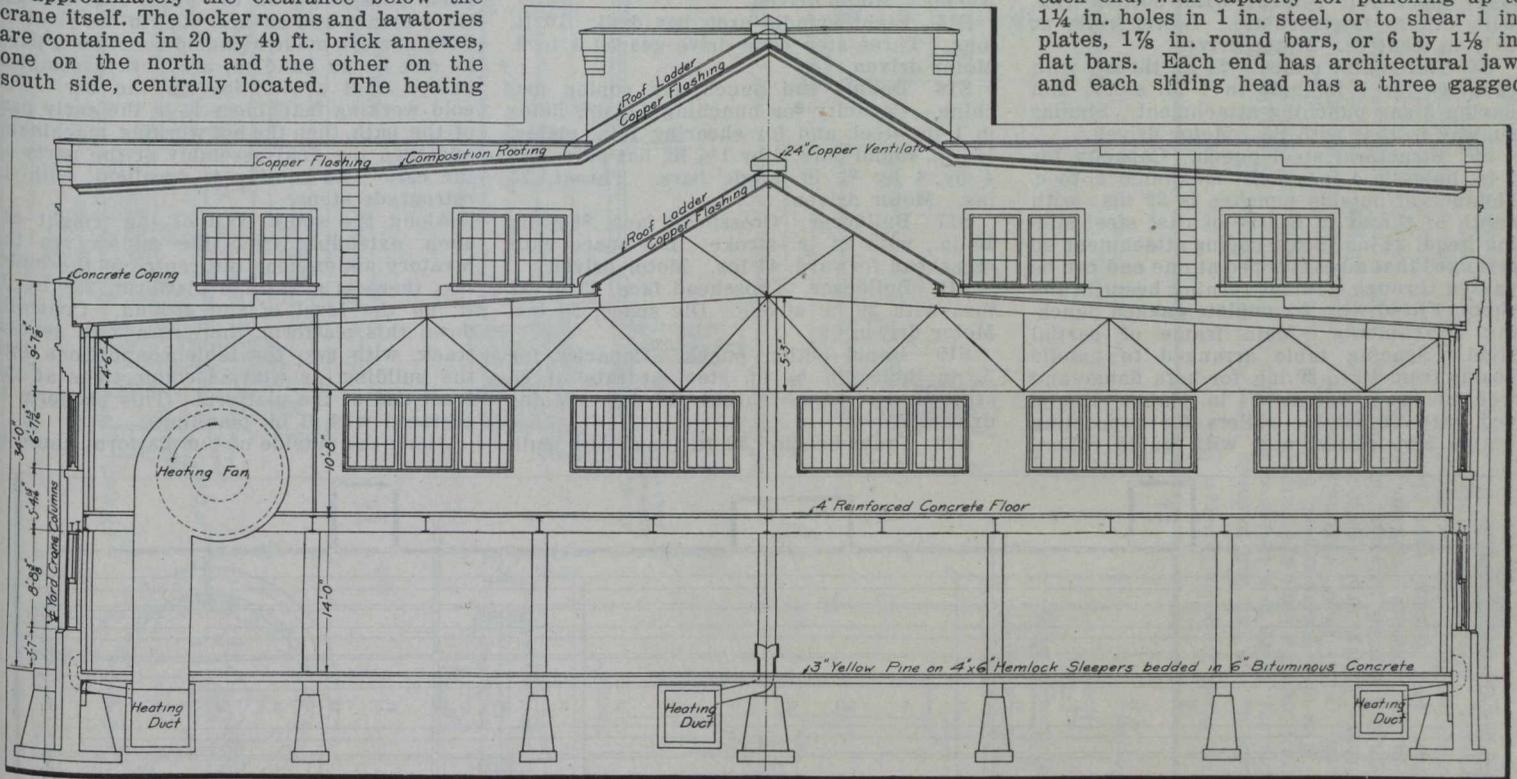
Cross Section of One of the Passenger Car Buildings, looking towards High End.
